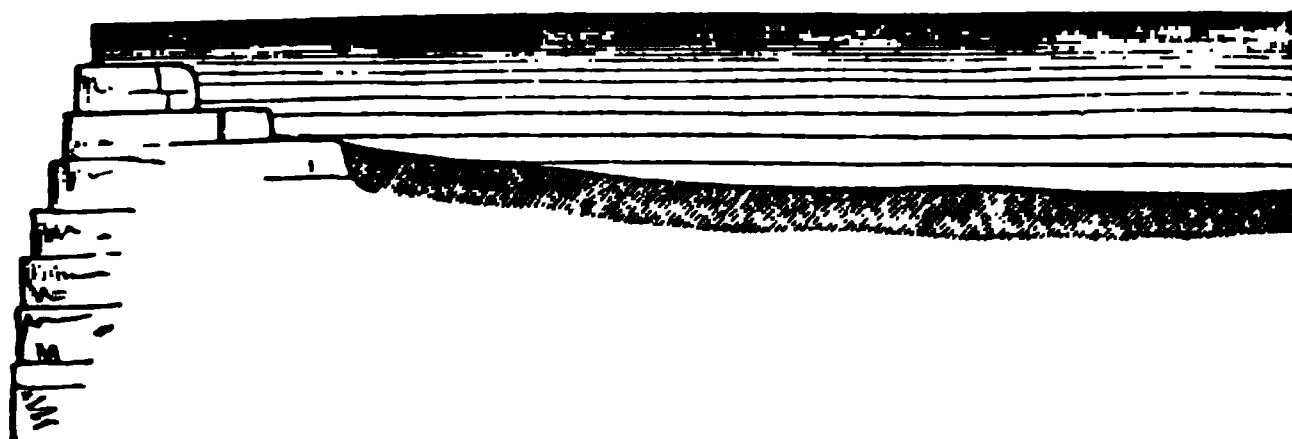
Section through Overfall.—Scale, 8 feet to 1 inch.
